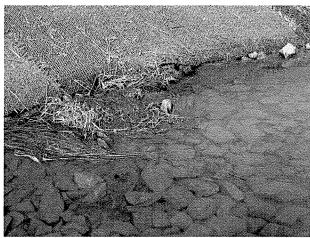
Looking downstream at log vane, root wads, and log toe protection installed between MC Stations 19+97 and 20+75. (9/27/04)
